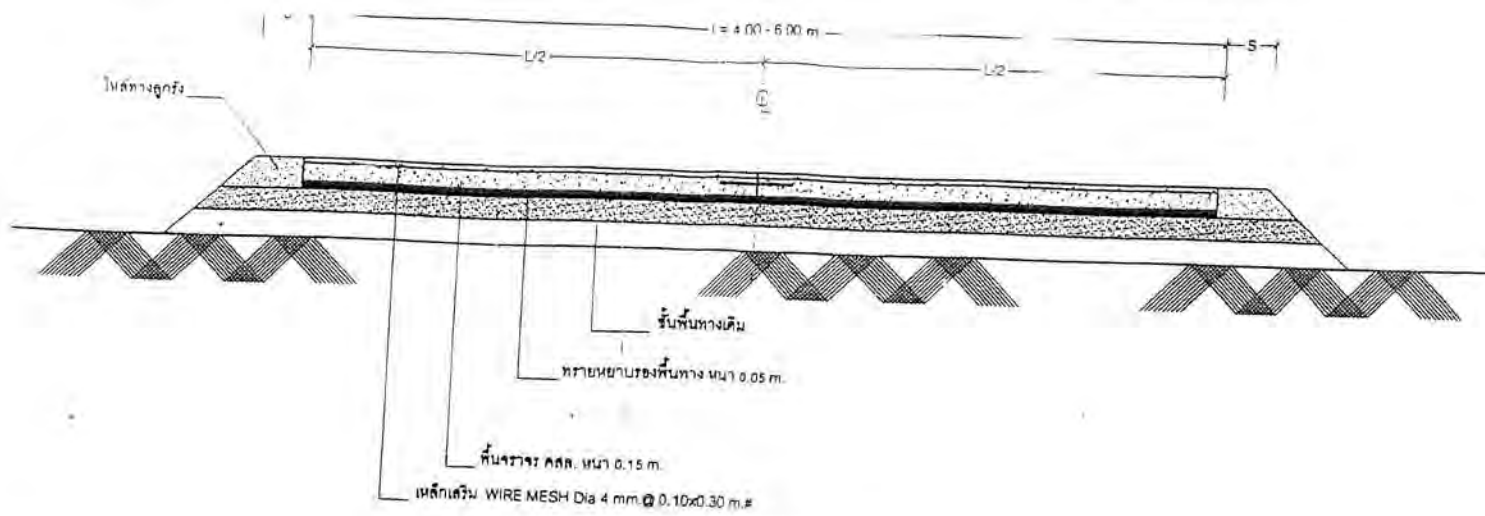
LONGITUDINAL JOINT (รอยต่อตามยาว)
